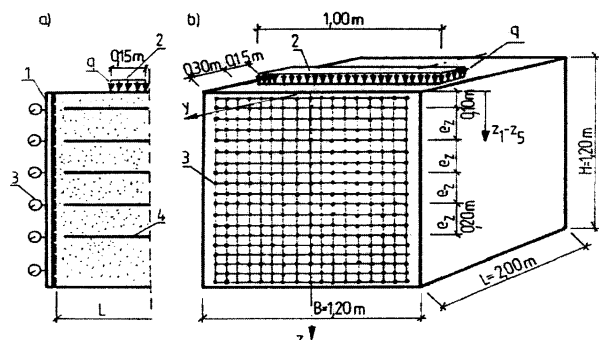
Design and basic parameters of test stand: a - block of longitudinal vertical intersection; b - general view; 1 - measurement wall (frontal one); 2 - load-carrying plate; 3 - horizontal rooms sensors; 4 - reinforcement belts
